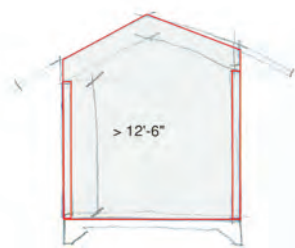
SITE SECTION EXAMPLE WITH ELEVATION PLANE
